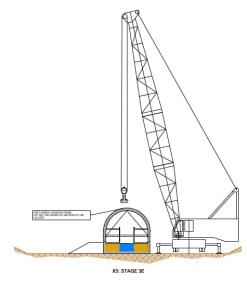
Extract from Camac Culvert Reopening Works drawings
